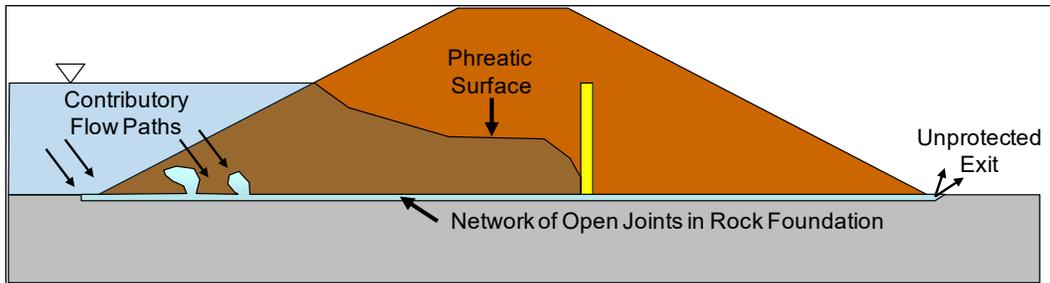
Internal erosion along the embankment-foundation contact.
